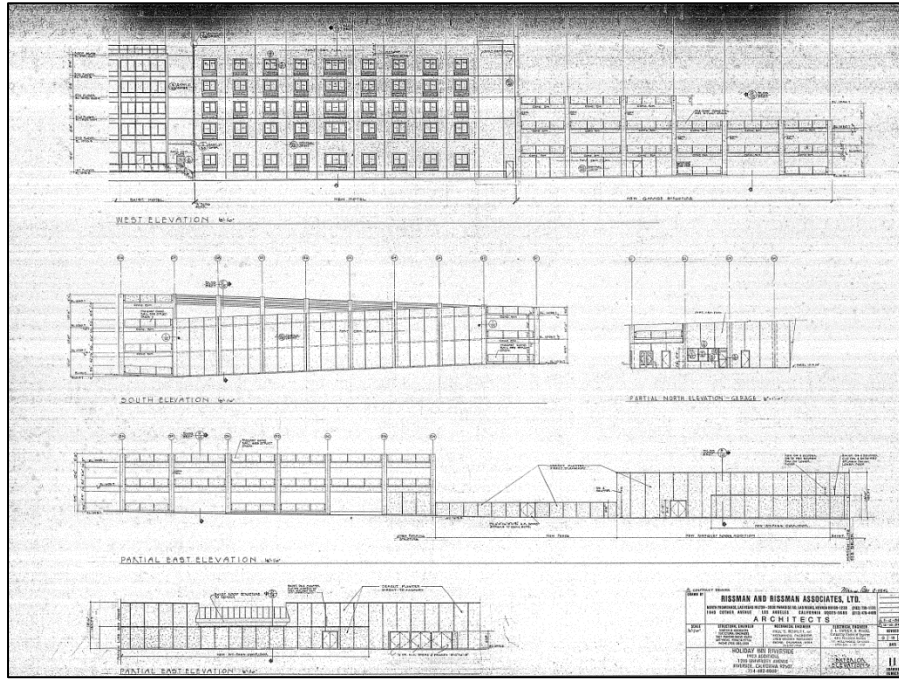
West, south, and east elevations, 1984 (Rissman & Rissman Associates)
